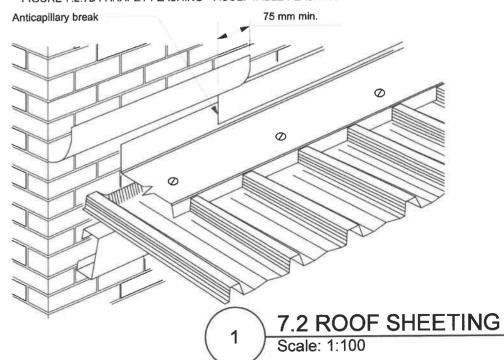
B PARAPET FLASHING—ACCEPTABLE FLASHING DETAILS
